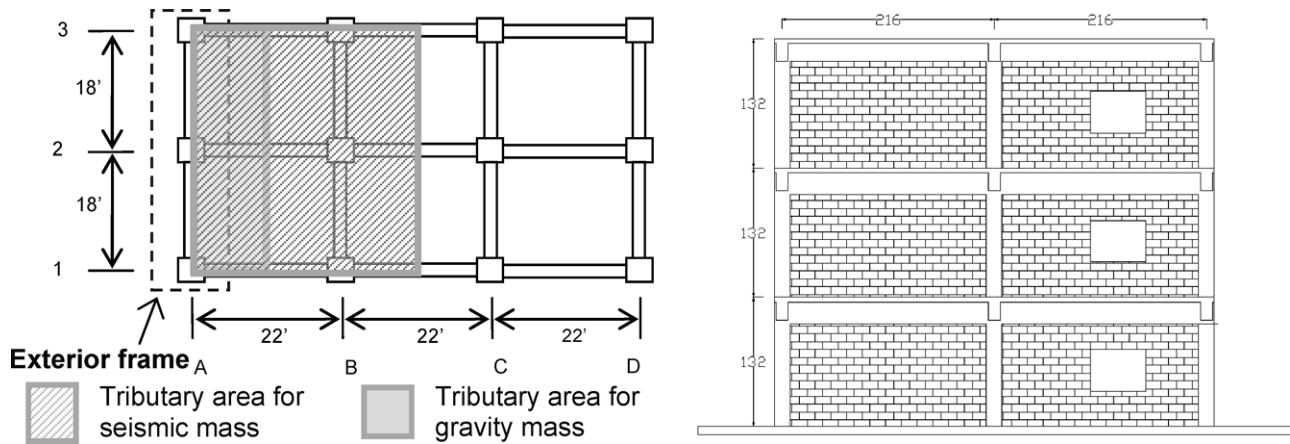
Plan view of the prototype structure (left) and Elevation view of an exterior frame (right)
